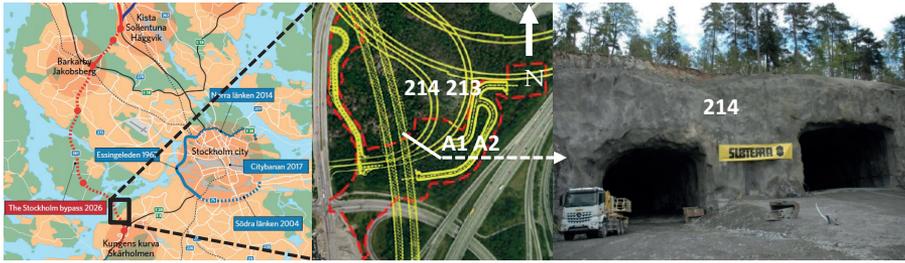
Stockholm bypass and Tunnels 213 and 214 location, layout and tunnel entrances (Illustrations courtesy of Trafikverket).
